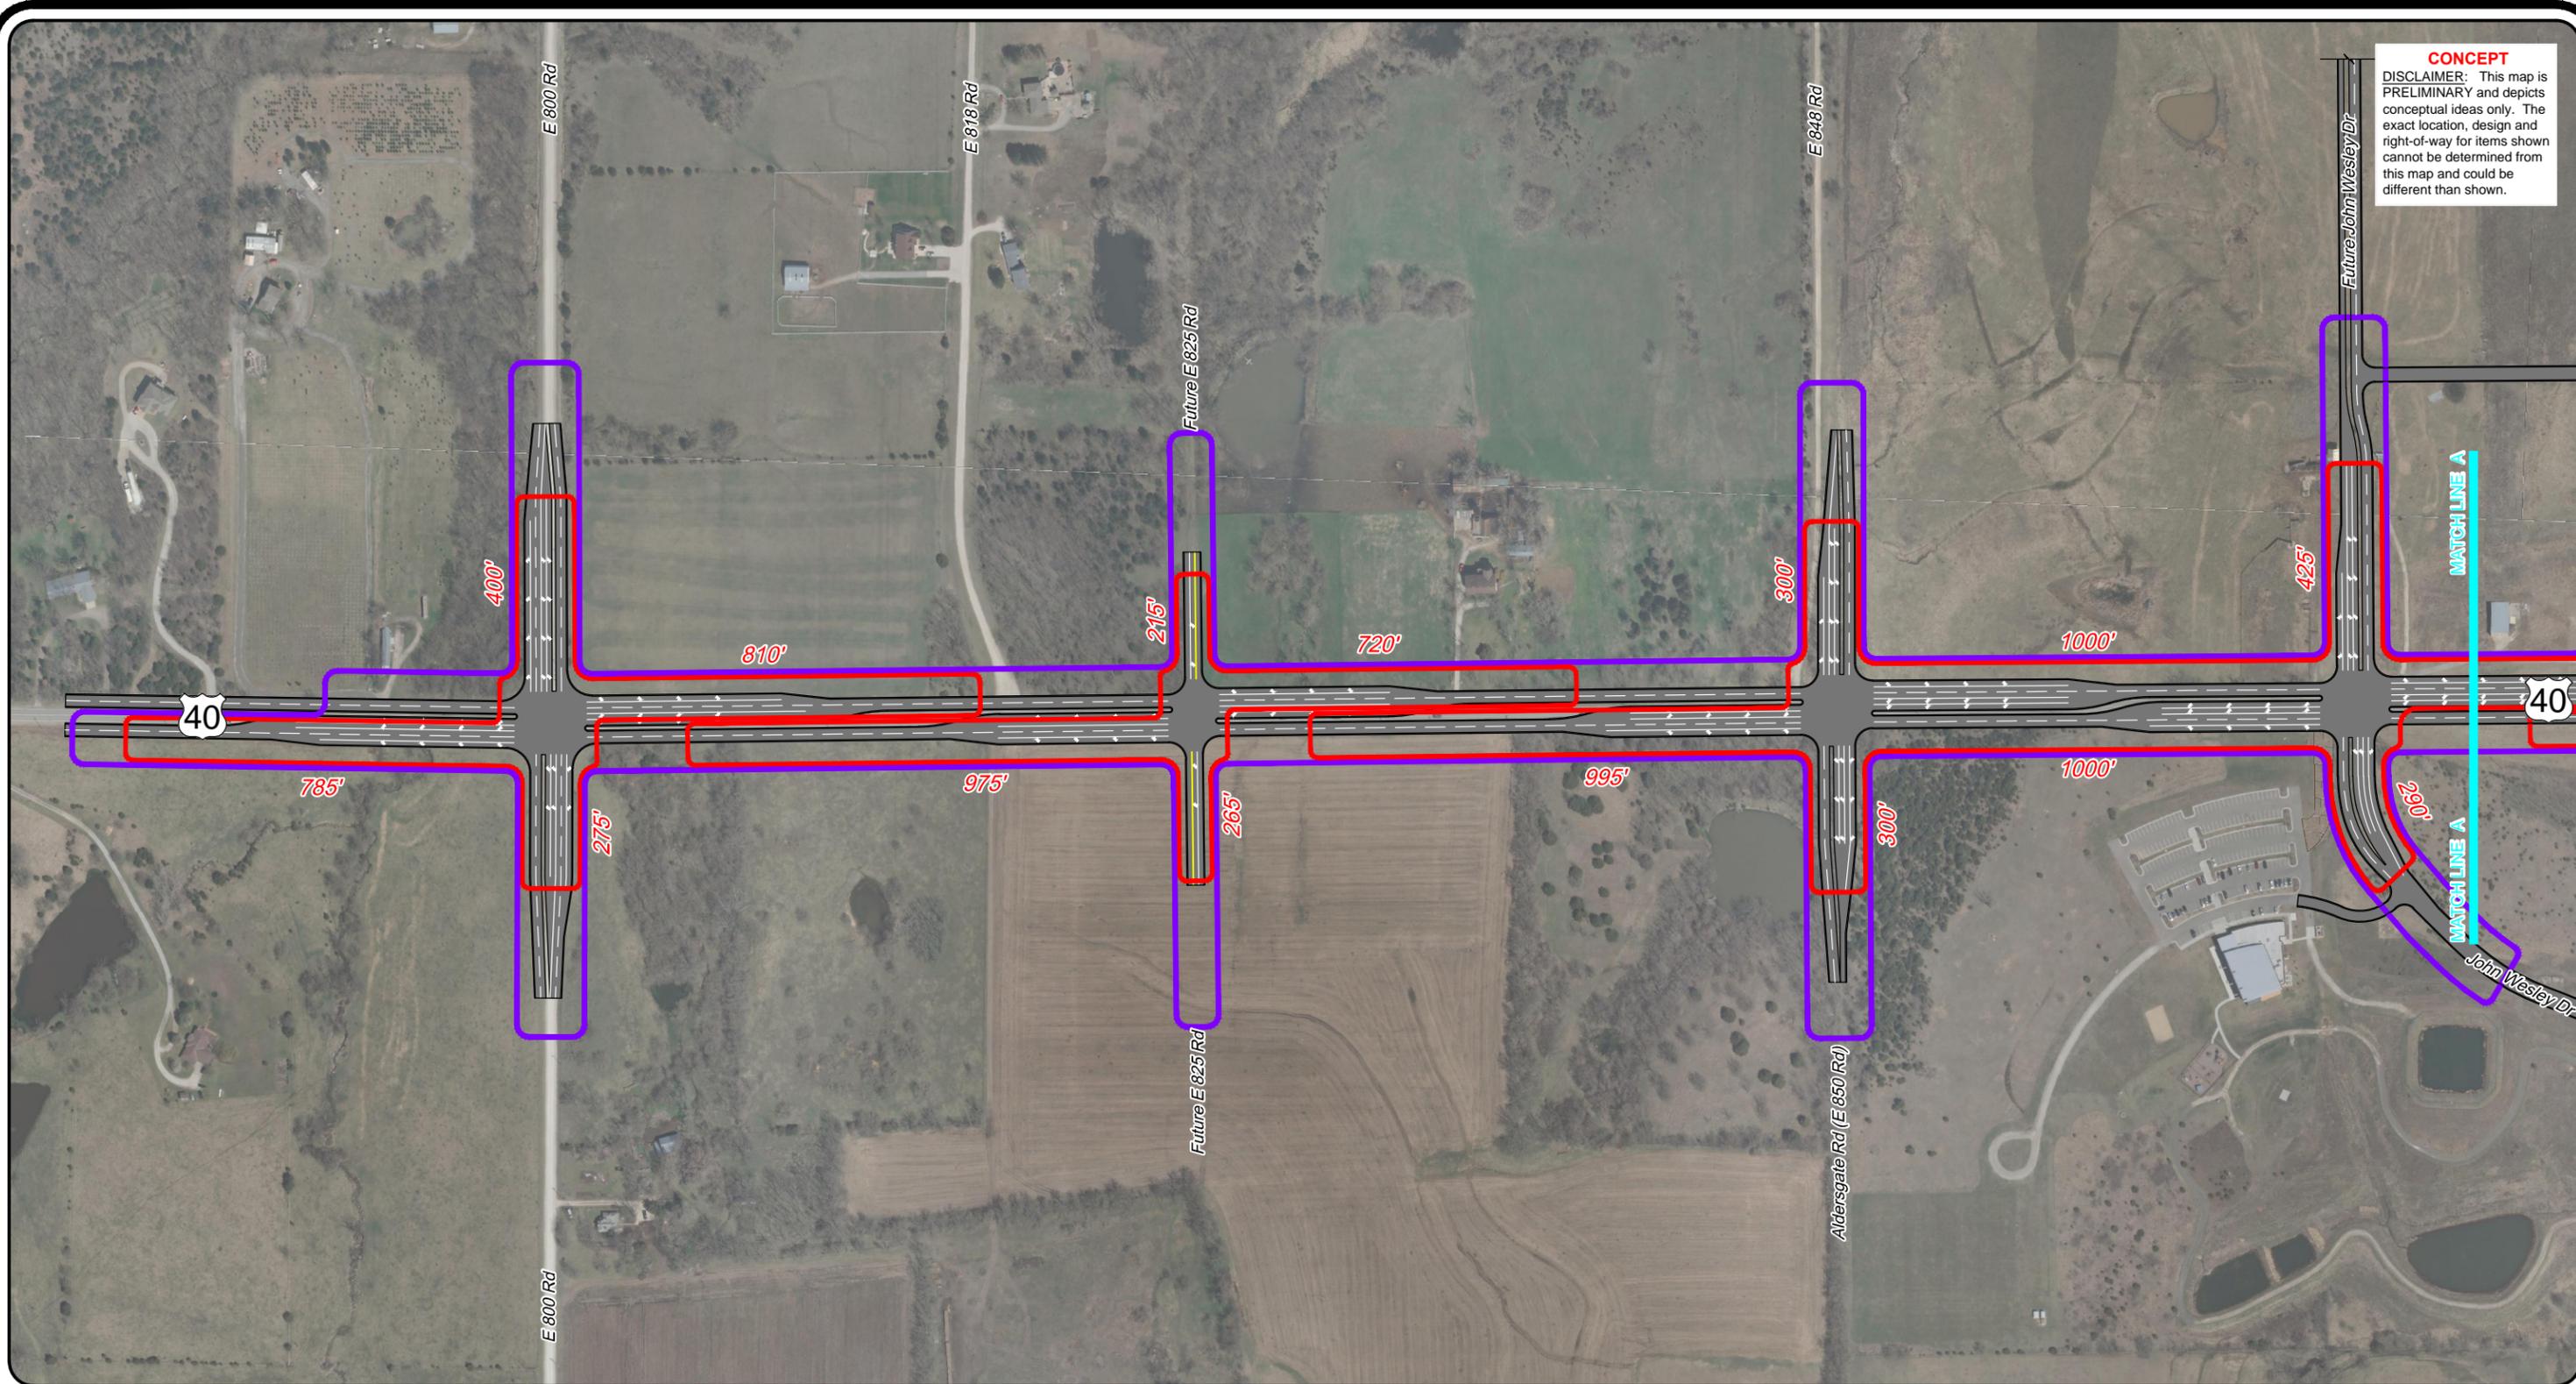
Long Term (2040) Plan & Profile 4 of 4
